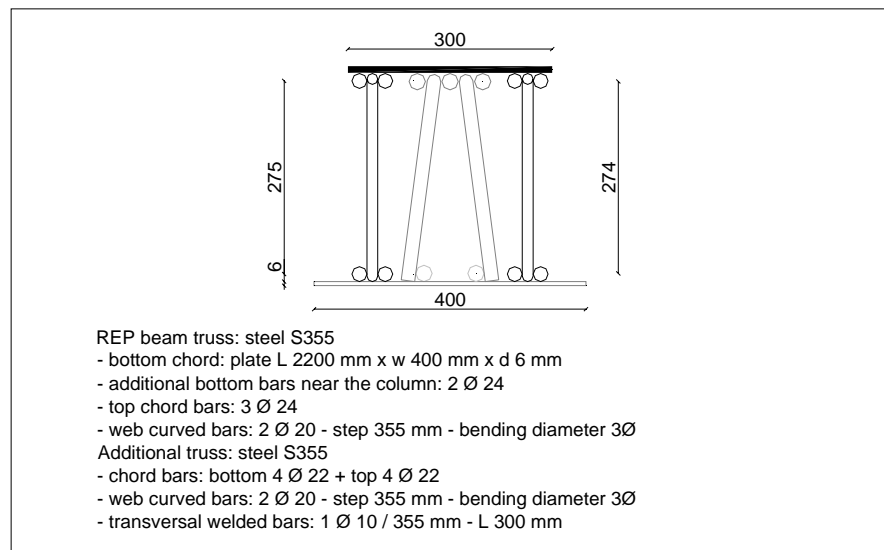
CSTC beam section with bottom steel plate and integrative truss
